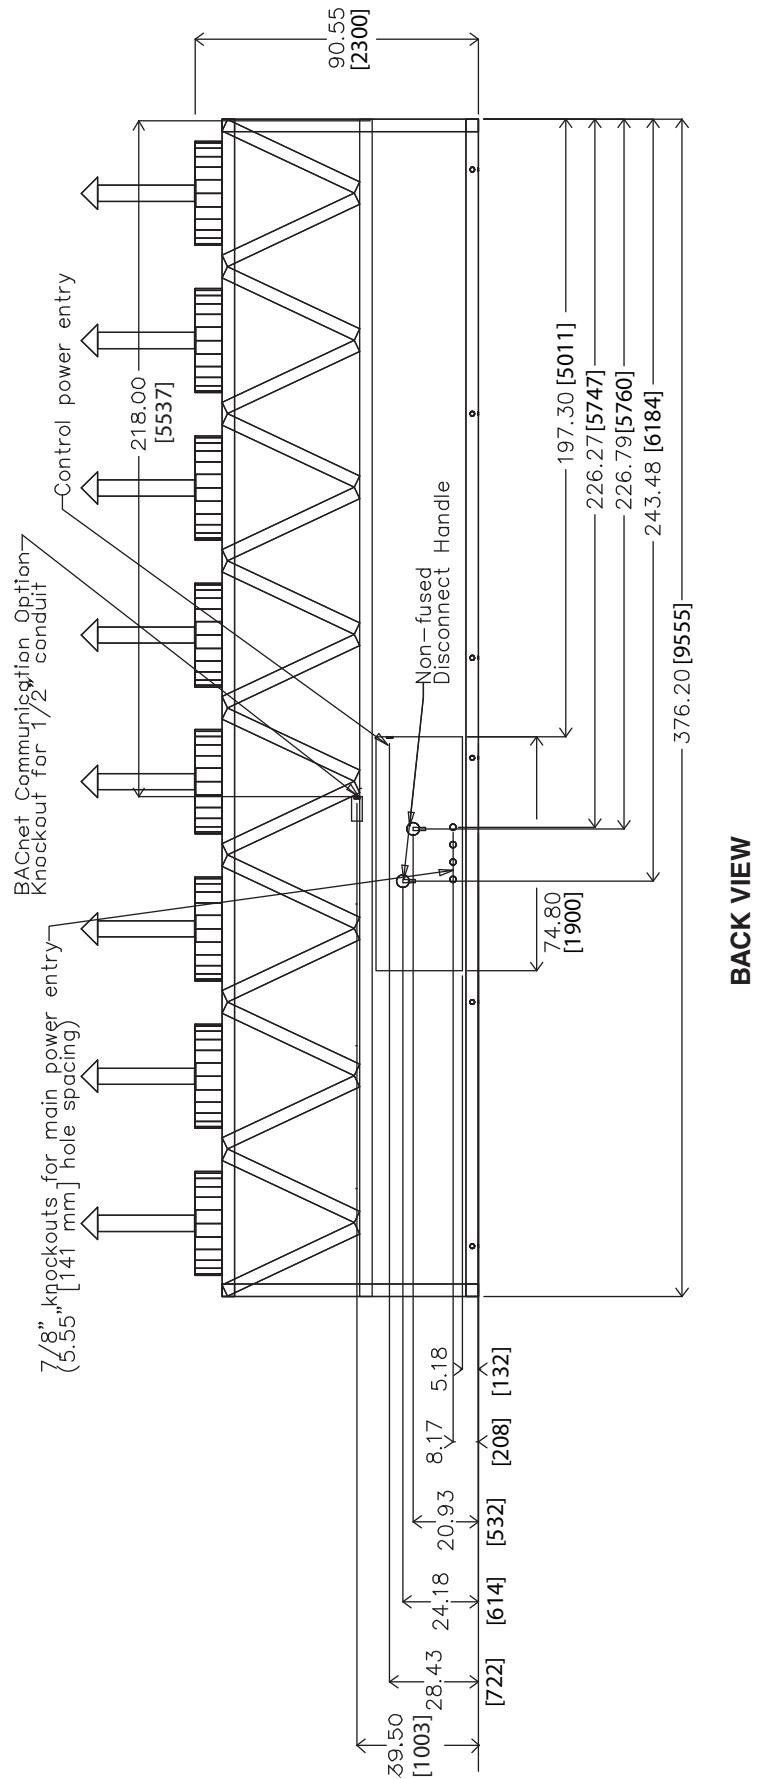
30XA260, 280, 300 Air-Cooled Liquid Chiller Dimensions (cont)
